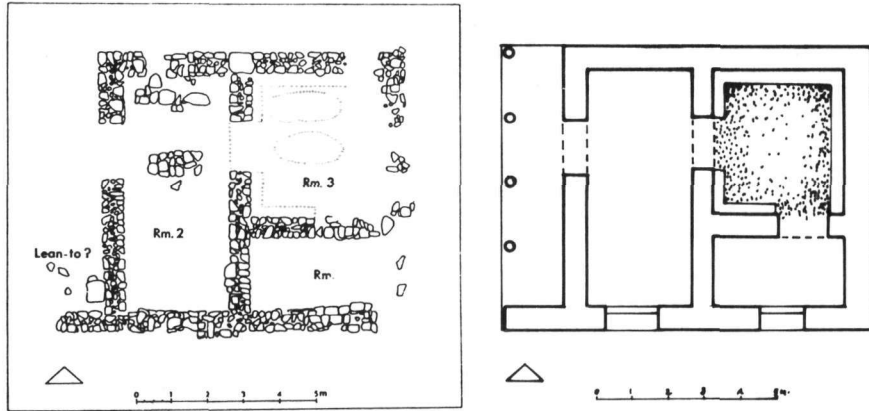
Armatova, Elis. A rural Byzantine house in area D. Plan of the remains after the excavation (J.A. Coleman) and suggested restored plan of the original building.
